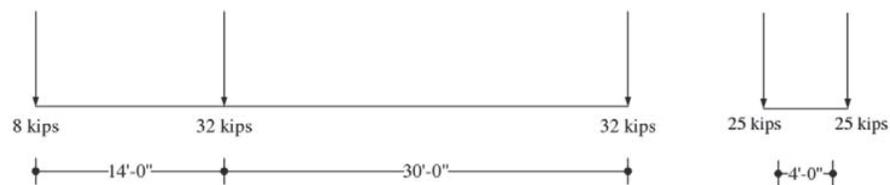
HL 93 design truck loads: (a) Axle load, (b) Tandem load.
